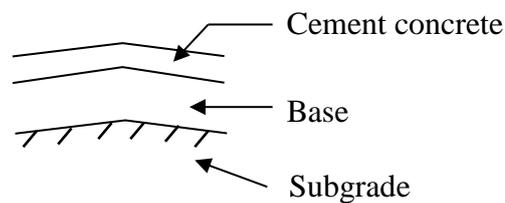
A typical cross-section of the cement concrete runway pavement
